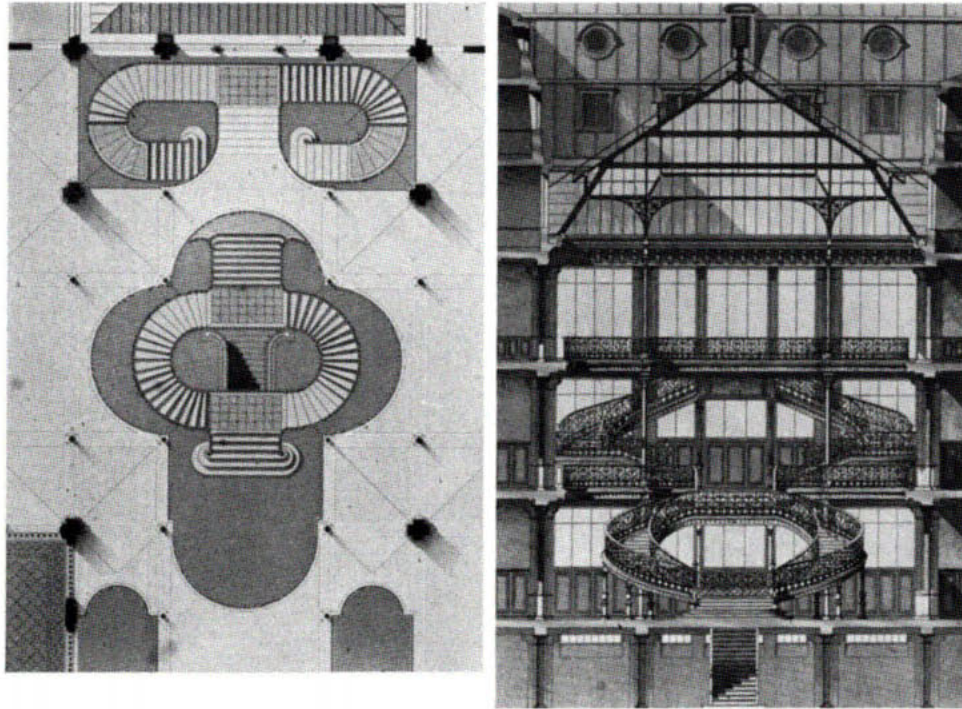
(LEFT). BON MARCHÉ, PARIS. PLAN OF STAIRS
